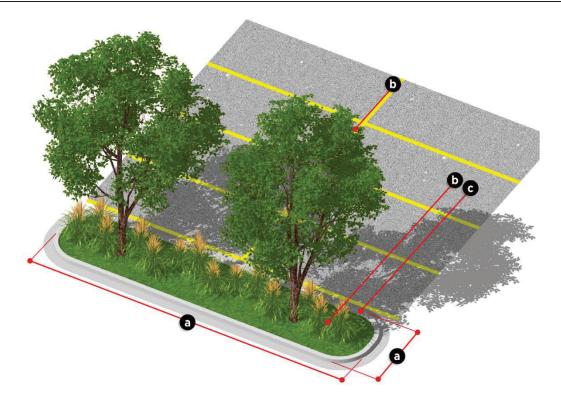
Off-Street Parking Area Interior Landscape Zone in Rear of Primary Building
